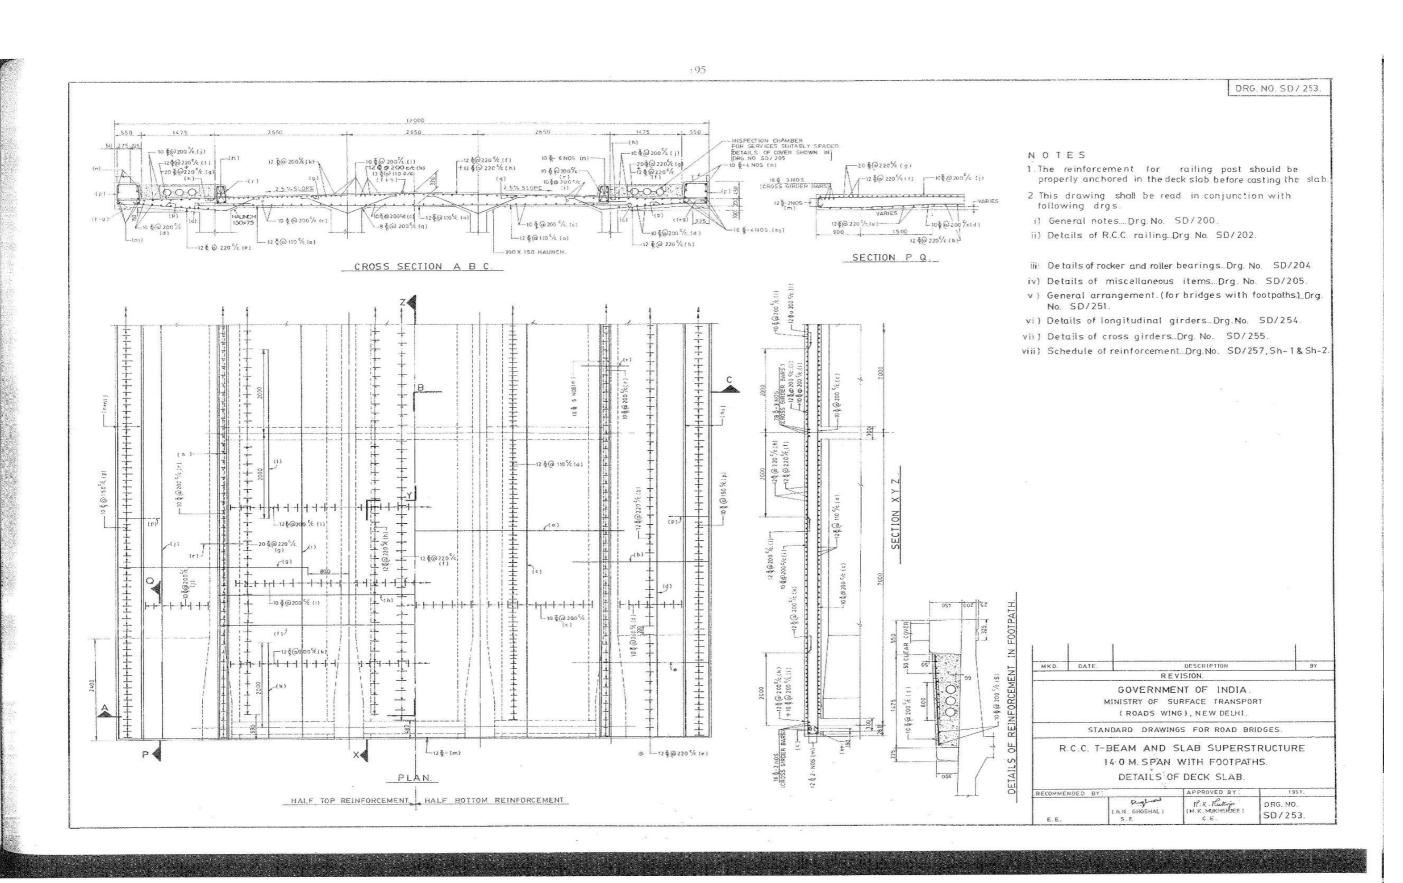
Details of Deck Slab (with Foot Paths)-Drawing No. SD/253
